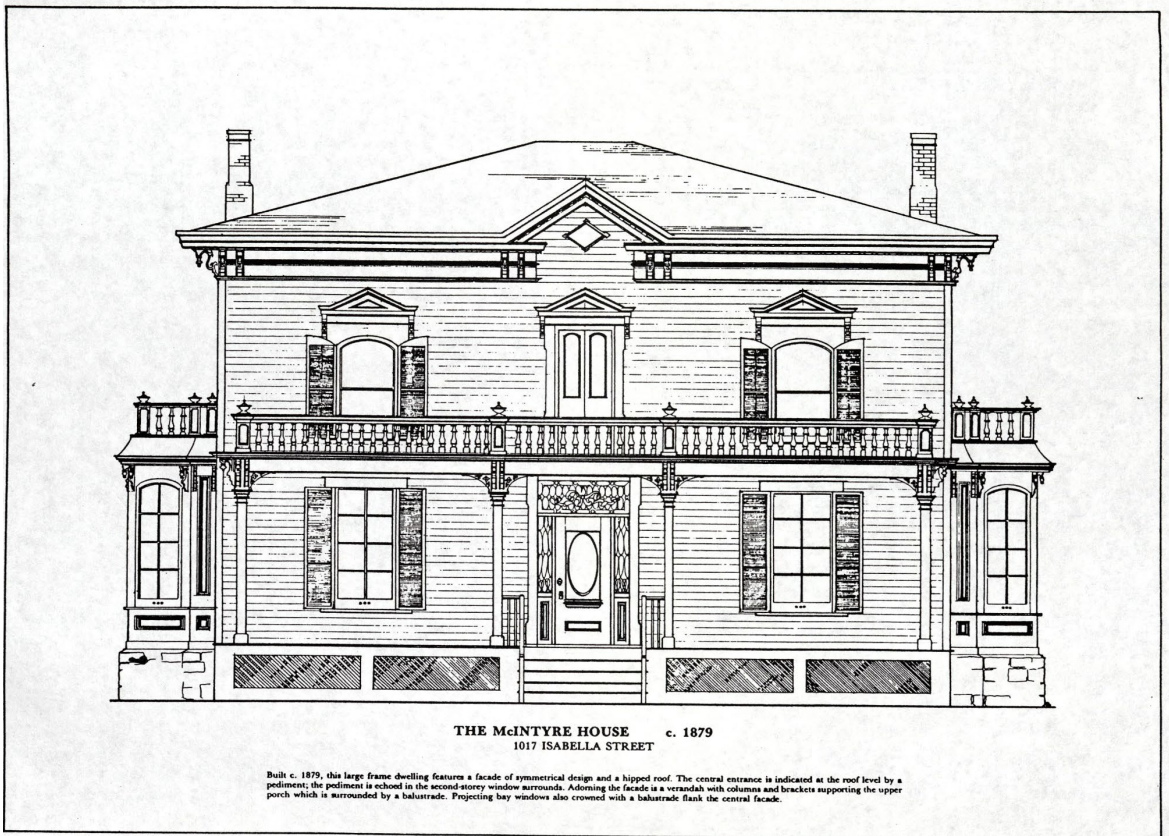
Sketch of the front elevation of the house prior to relocation (Source: Thunder Bay Public Library Files)
